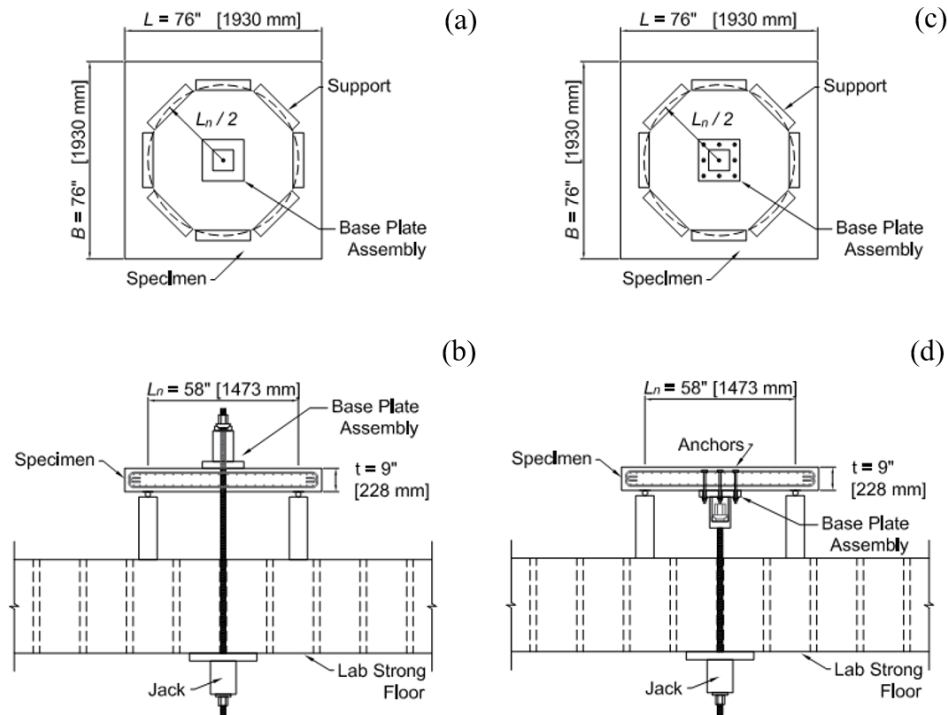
Specimen dimensions and test setup configuration schematics: Punching shear test setup, (a) plan view and (b) elevation; Concrete breakout test setup, (c) plan view and (d) elevation.
